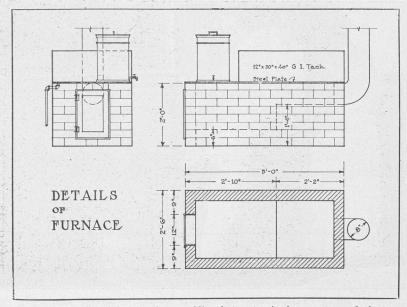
Details of furnace for providing hot water in furnace type of plant.
